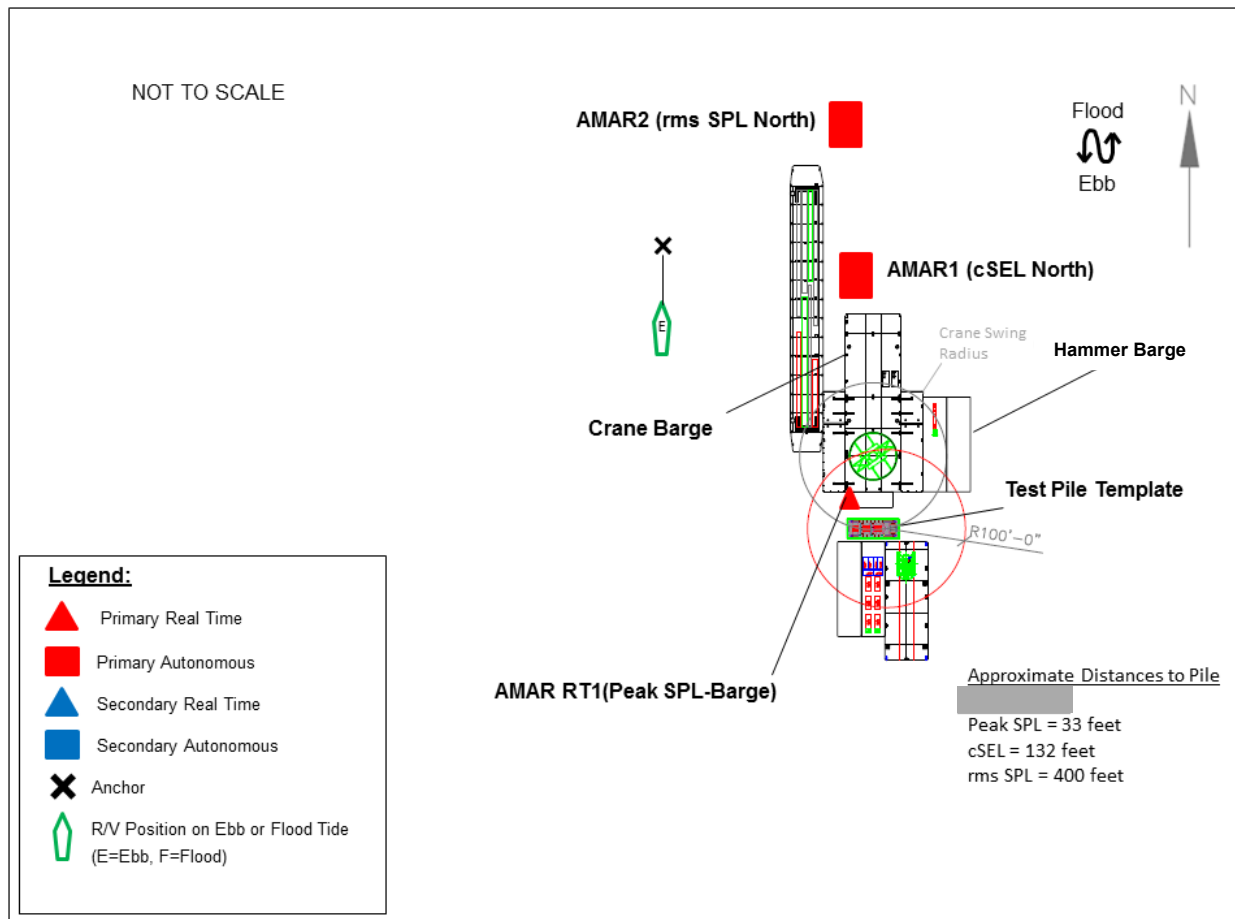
Plan View of a Typical Test Pile Barge Arrangement and Hydrophone Locations for Piles
